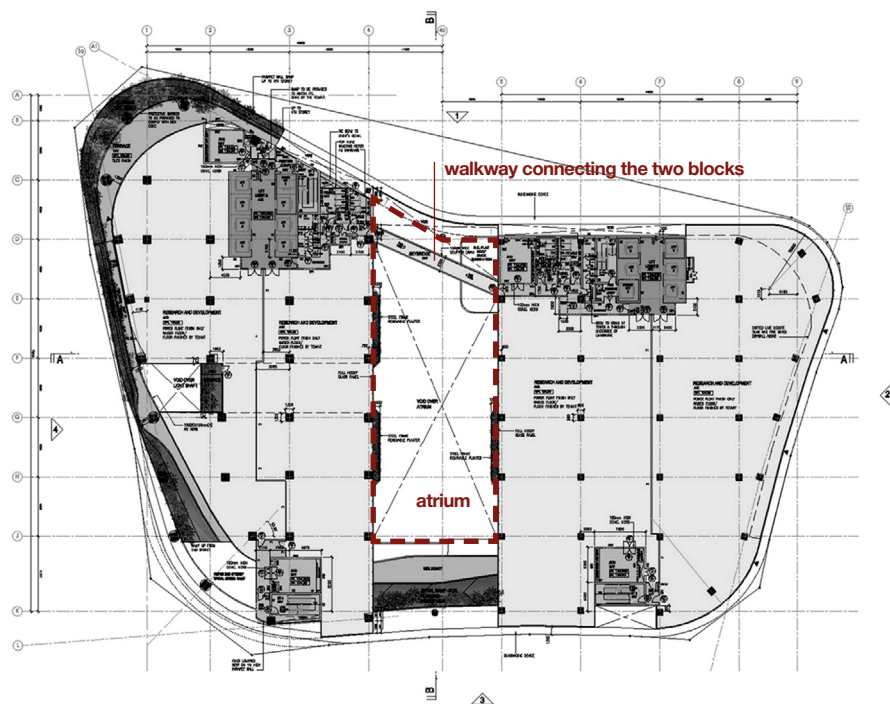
Third-floor plan of the Solaris building. Source: T.R. Hamzah & Yeang, 2014.
